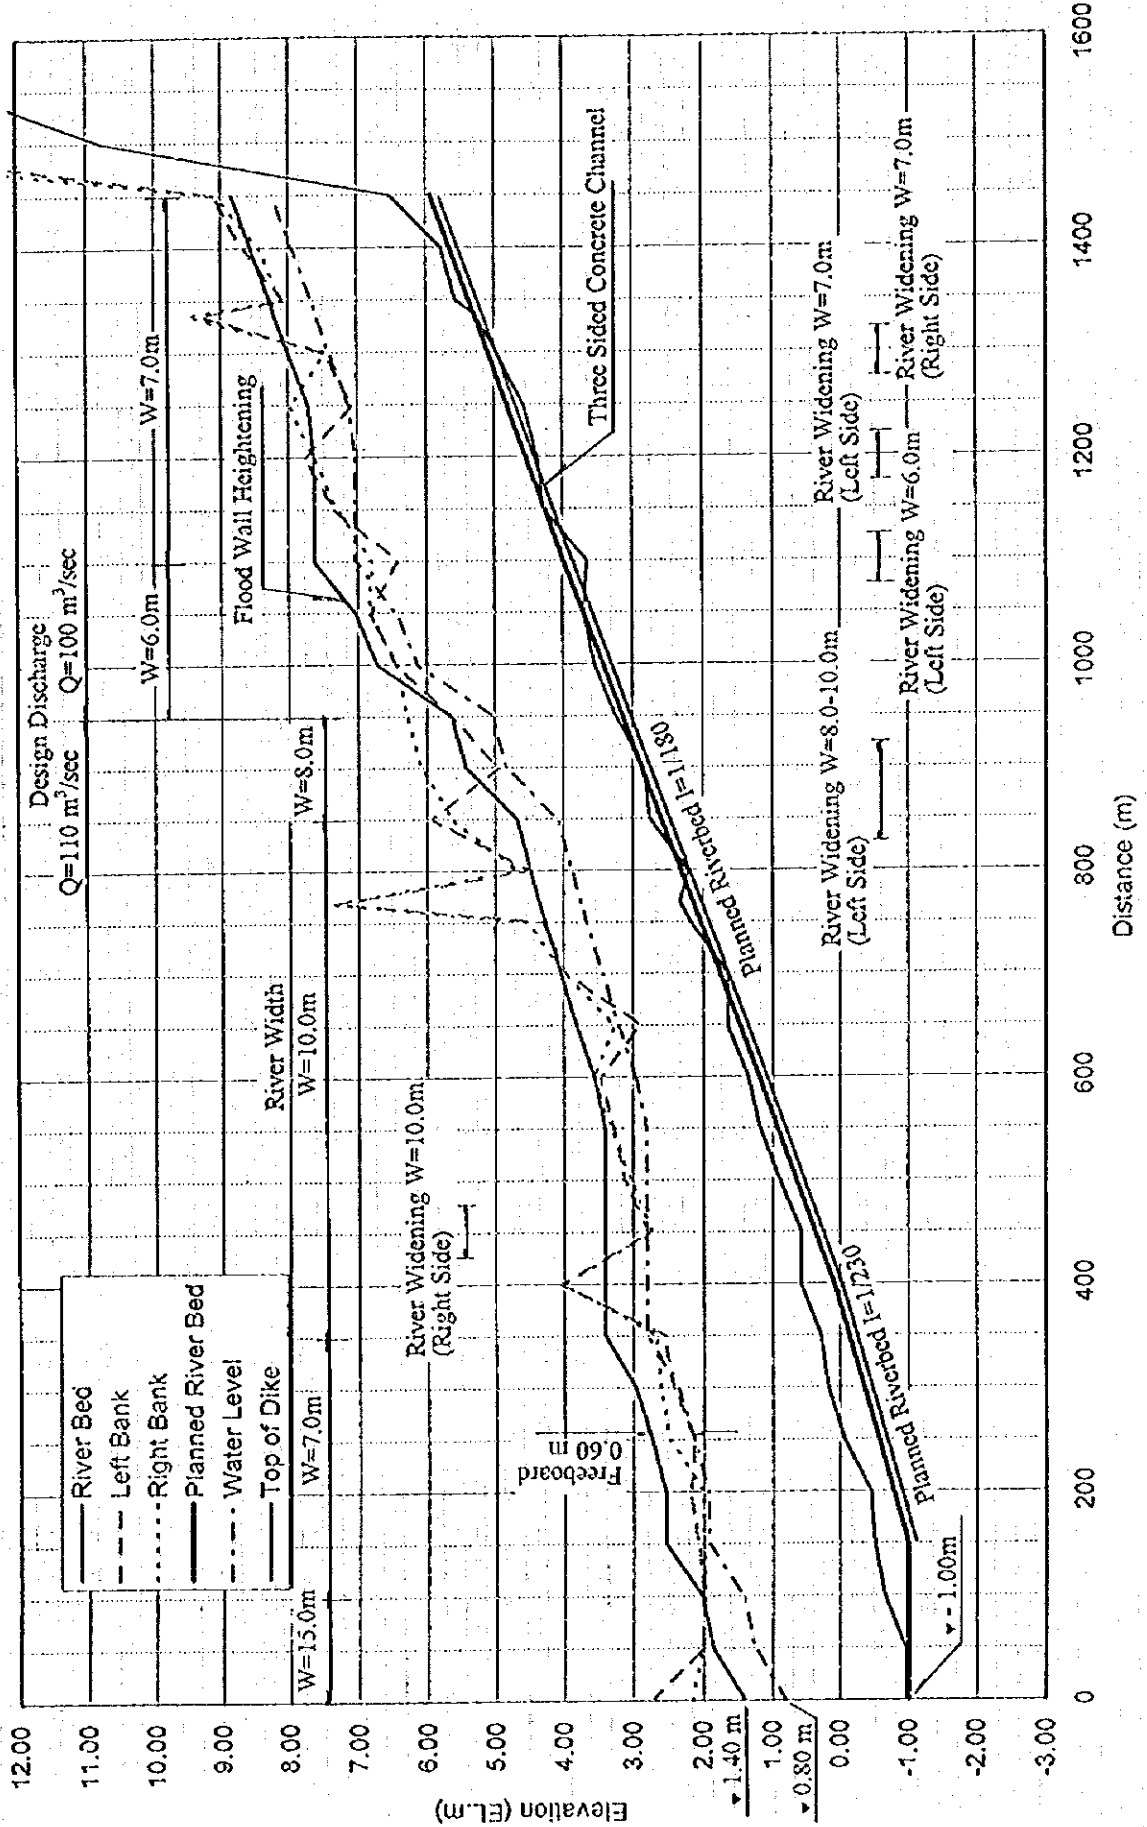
Longitudinal Section of Batu Gantung River Improvement Plan
